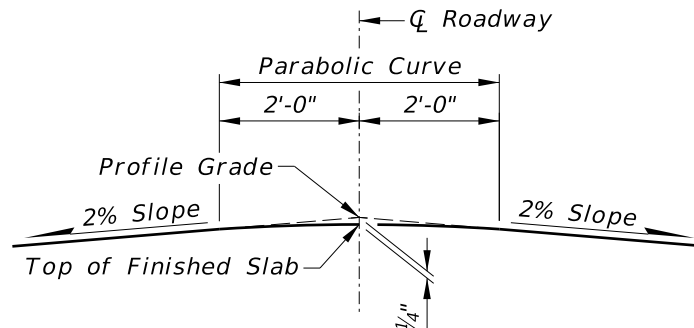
DRIPBnew Cell (Bridge Deck Library)
